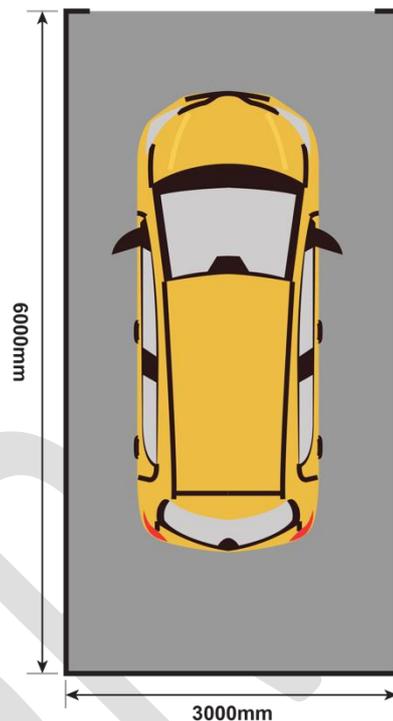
Minimum garage dimensions if cycle parking is provided elsewhere
